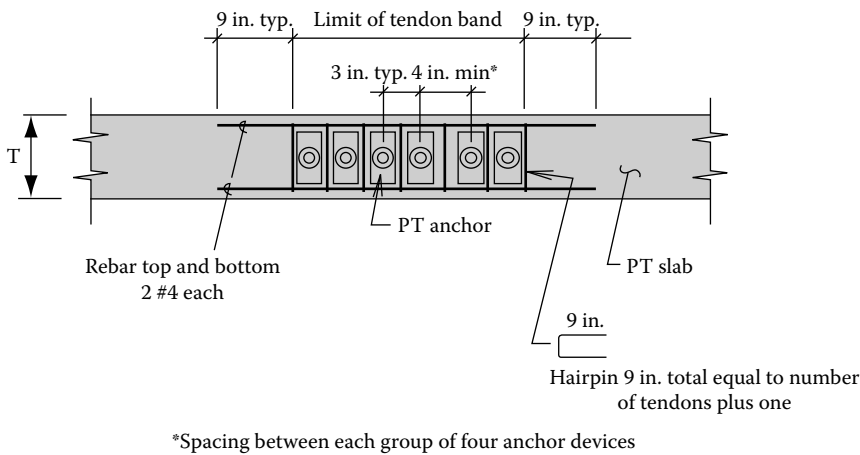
Typical reinforcement of tendon band at slab edge or at intermediate stressing.
